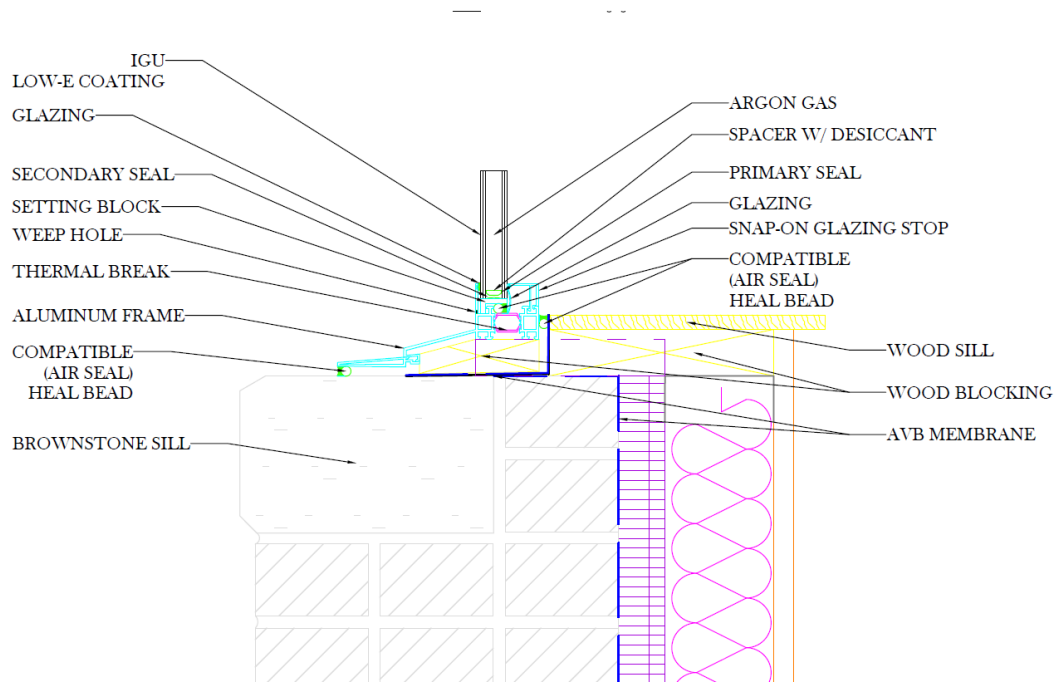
Stratton Hall Schematic Drawing 4-Lower Window Section
